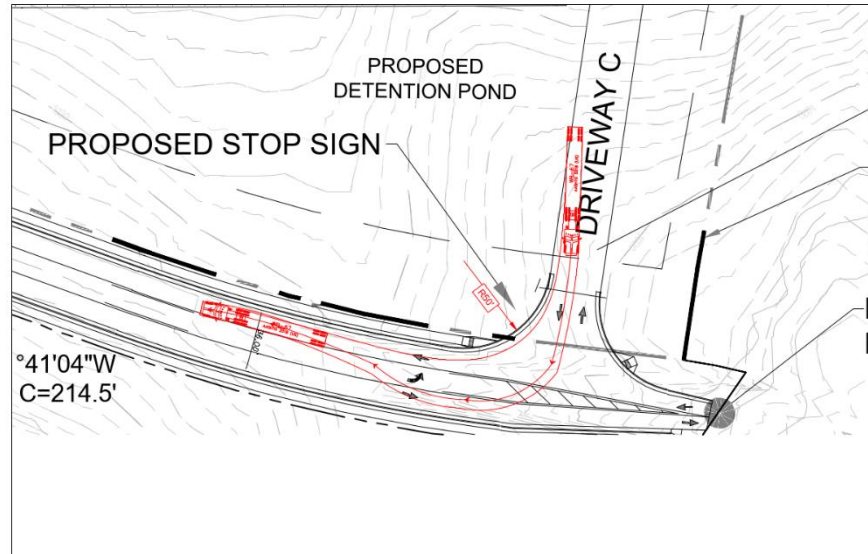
Stanley Road at Driveway C – Westbound Right (Exiting Truck)
